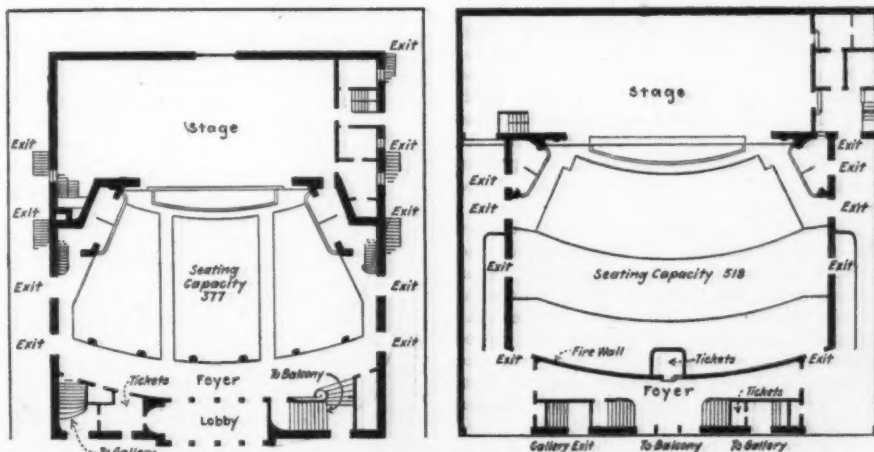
Typical and proposed theater plan showing use of fire walls, side entrances and exits.
